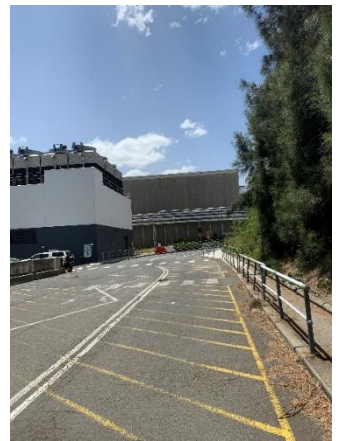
Image taken facing north from King Street showing secure driveway and Storage shed to the right
